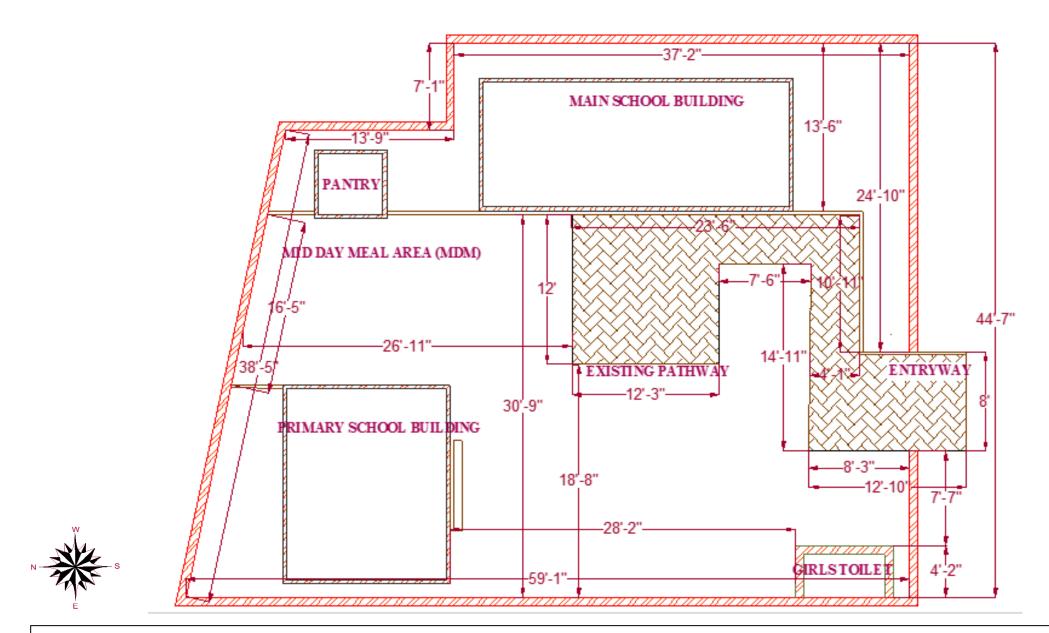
WORKING DRAWING OF EXISTING FLOOR PLAN OF THE SCHOOL
